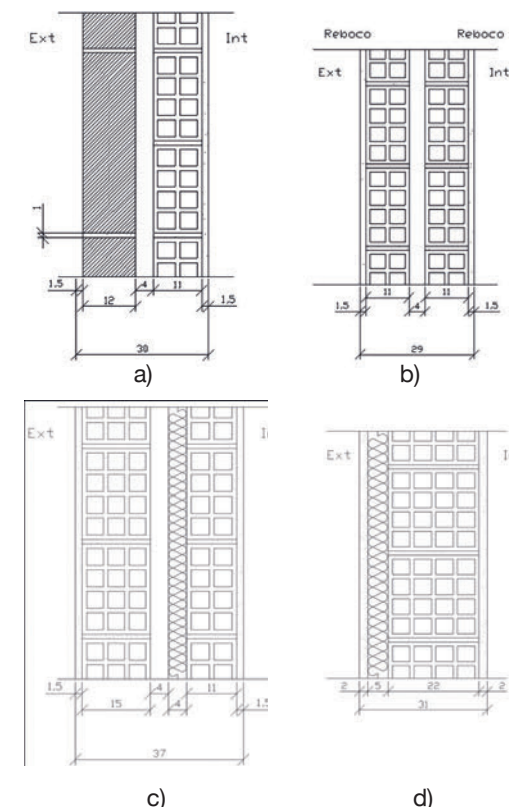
Hollow brick external walls: a) Double with stone masonry on the exterior leaf, without thermal insulation; b) Double without thermal insulation; c) Double with thermal insulation; d) Simple with external insulation (ETIC system)
